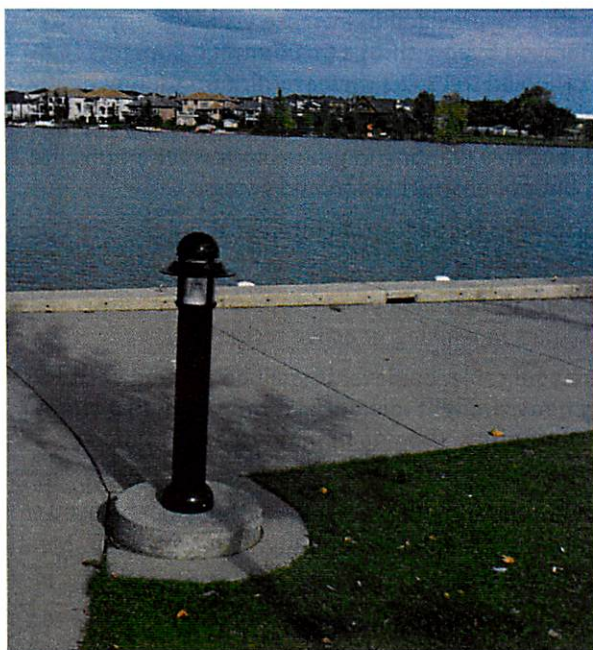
Illuminated bollards are one way to light pedestrian sidewalks where specific lighting is required, but general lighting is not necessary
